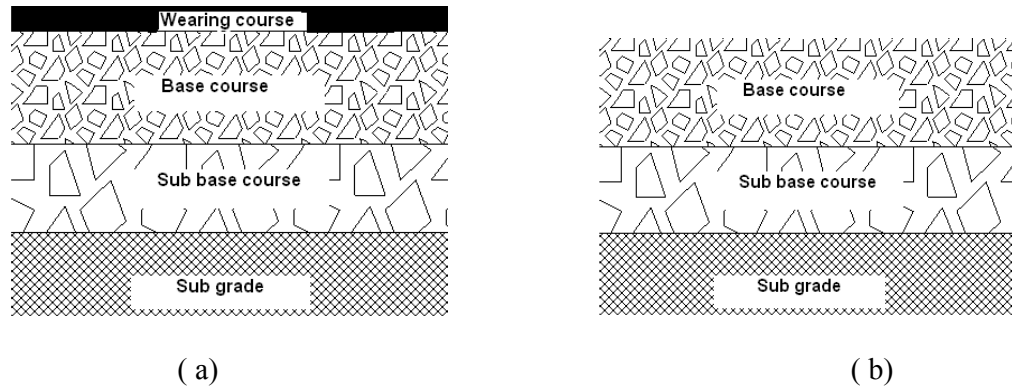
Pavements structure a) Bound pavement, and b) Unbound pavement
